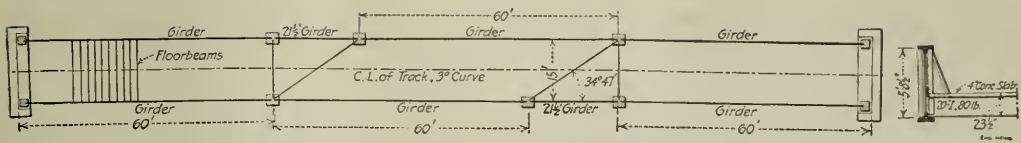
THREE-SPAN PLATE-GIRDER BRIDGE WITH THREE-POST TOWERS; EL PASO &amp; SOUTHWESTERN, RY.
